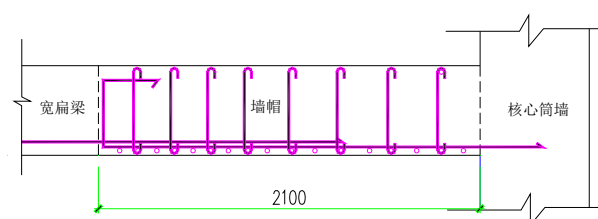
The reinforced lap diagram of wall cap and core barrel wall, beam and tableting
